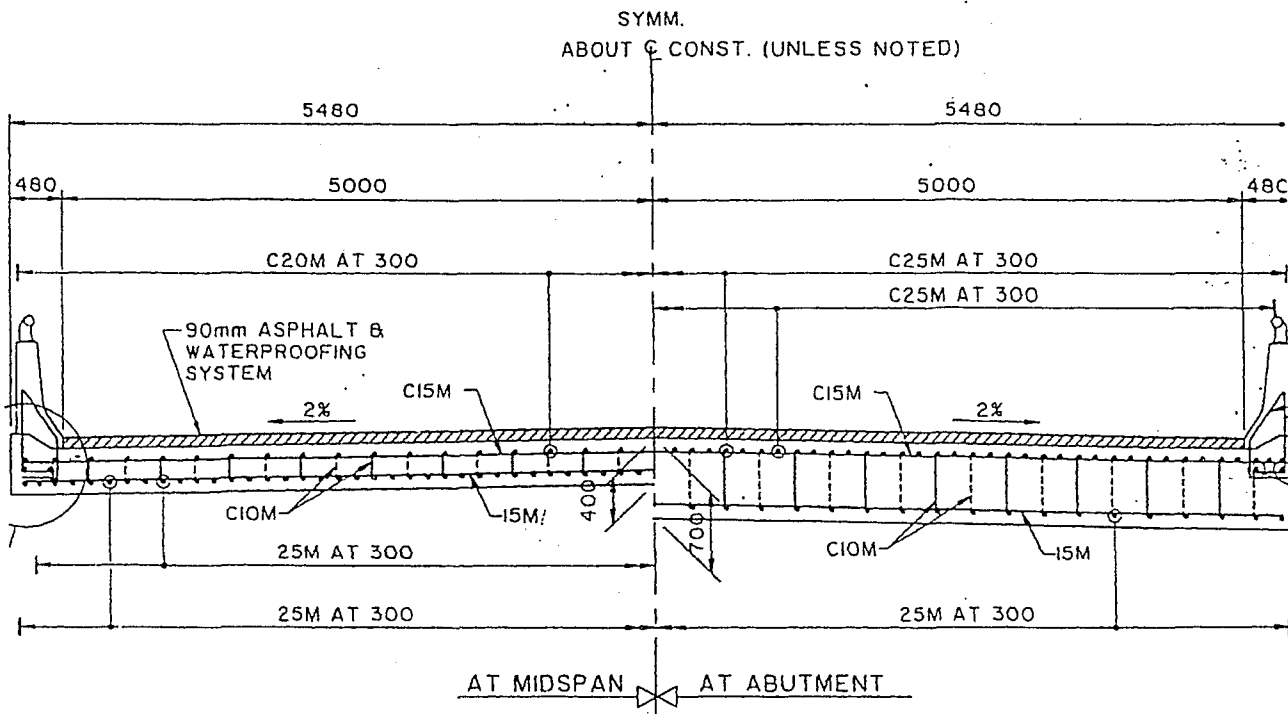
Cross-section of new deck, 19th Ave. bridge, Markham, Ontario
